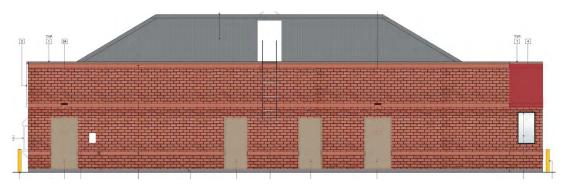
Proposed changes to rear (north) side of building are minor and include repainted service doors and new grey roof colour. Brick work is existing.
